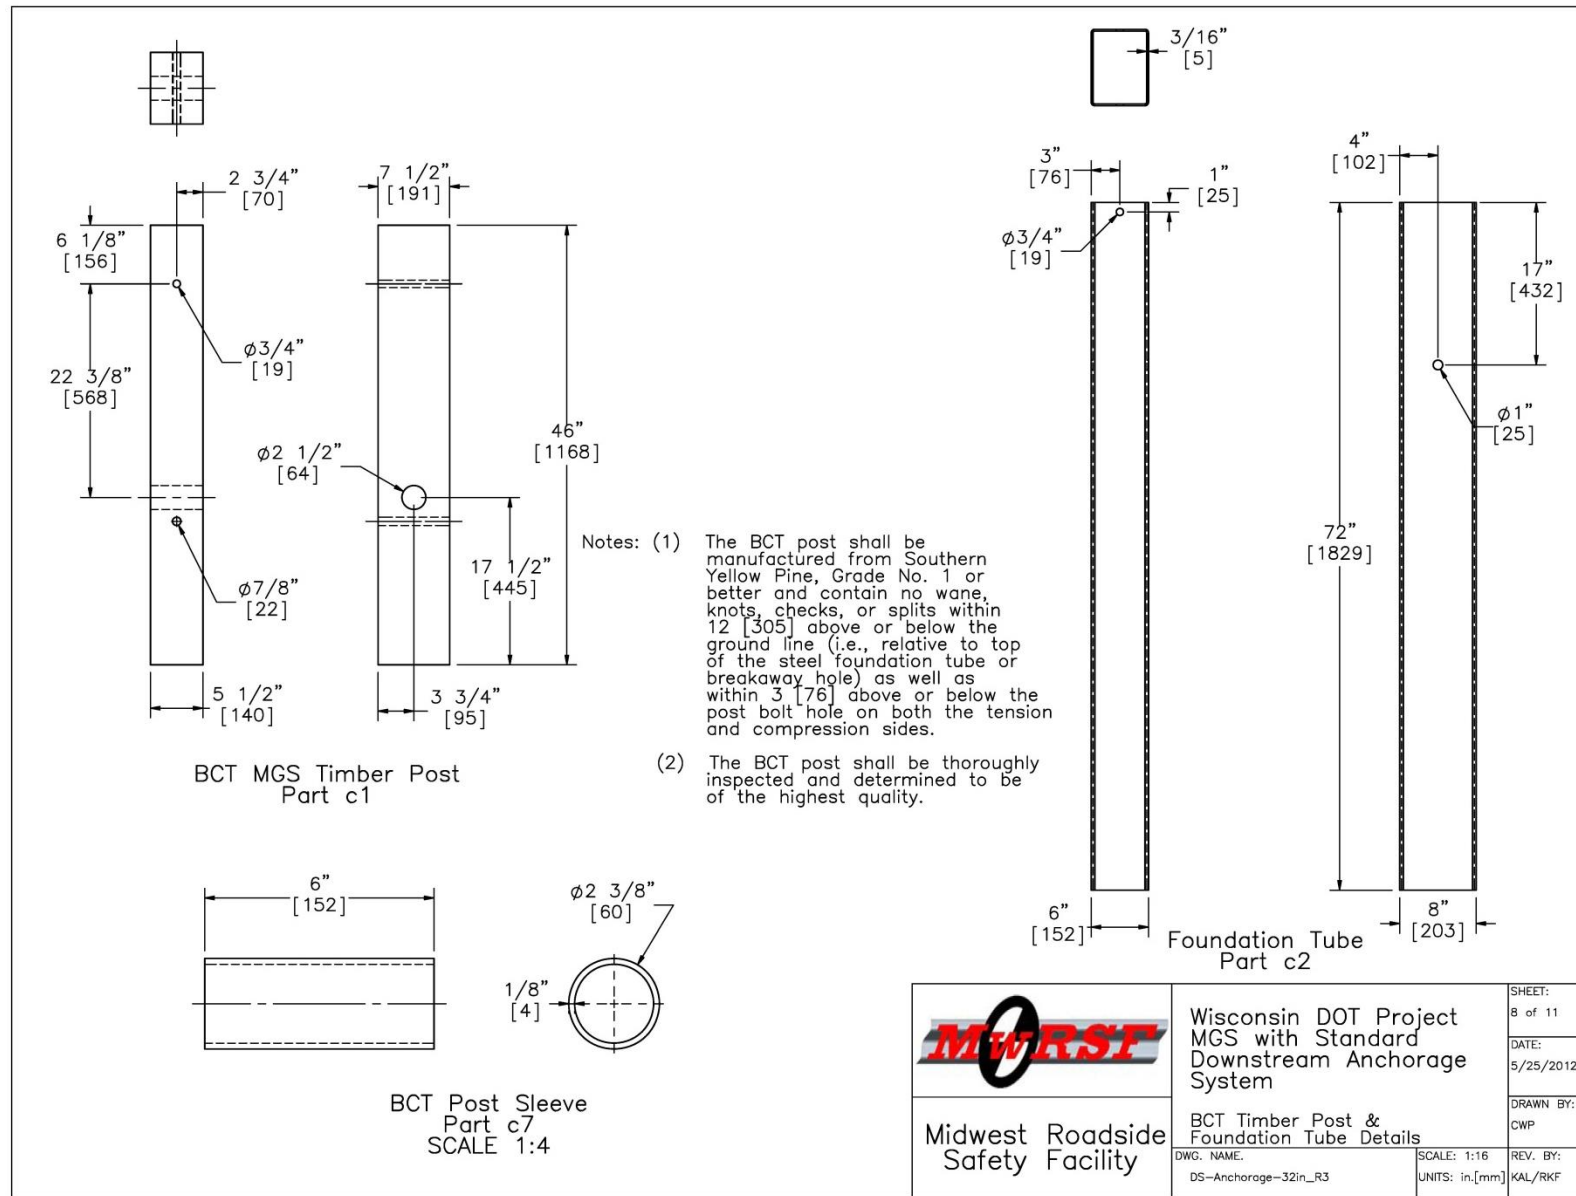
BCT Timber Post and Foundation Details, Test No. WIDA-2
